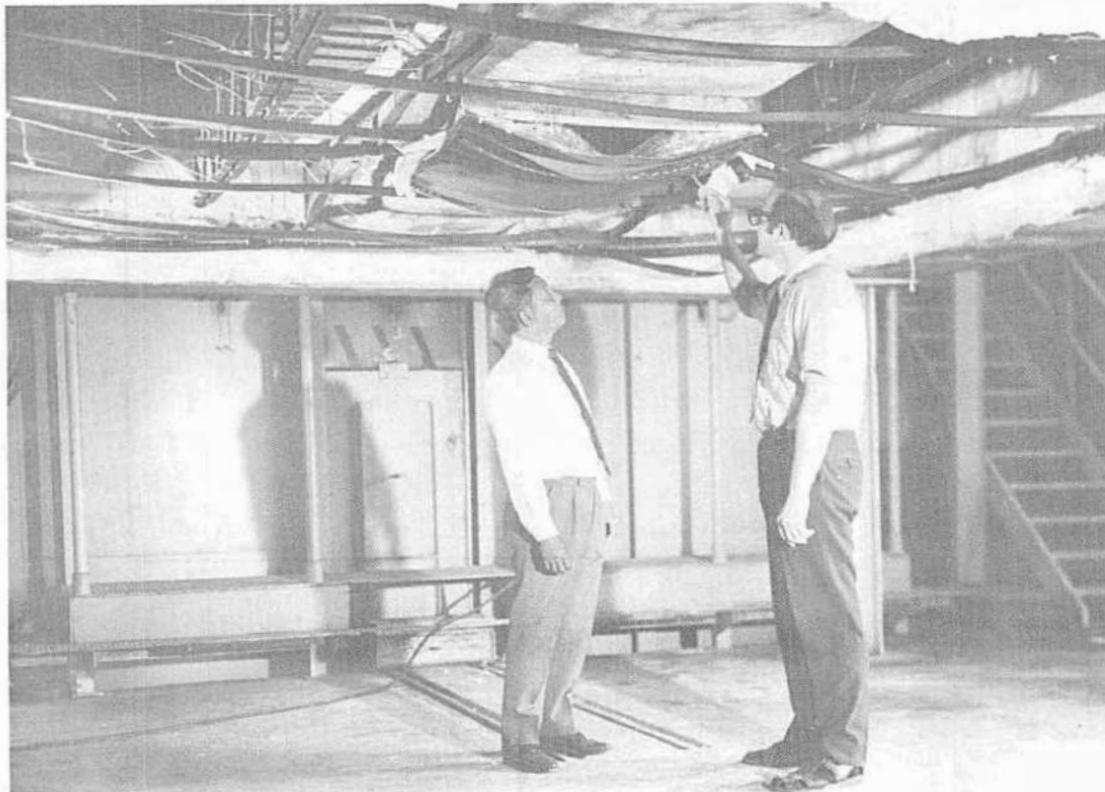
ASSEMBLY NO. 2 AFTER FIRE TEST
